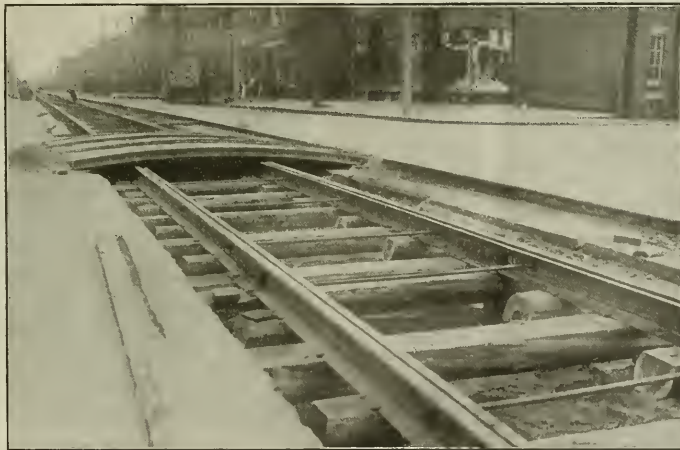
Dundas Street Track Reconstruction; Concrete Foundation, Sheet Asphalt Wearing Surface. One Track Completed; Ready for Concreting Other Track
